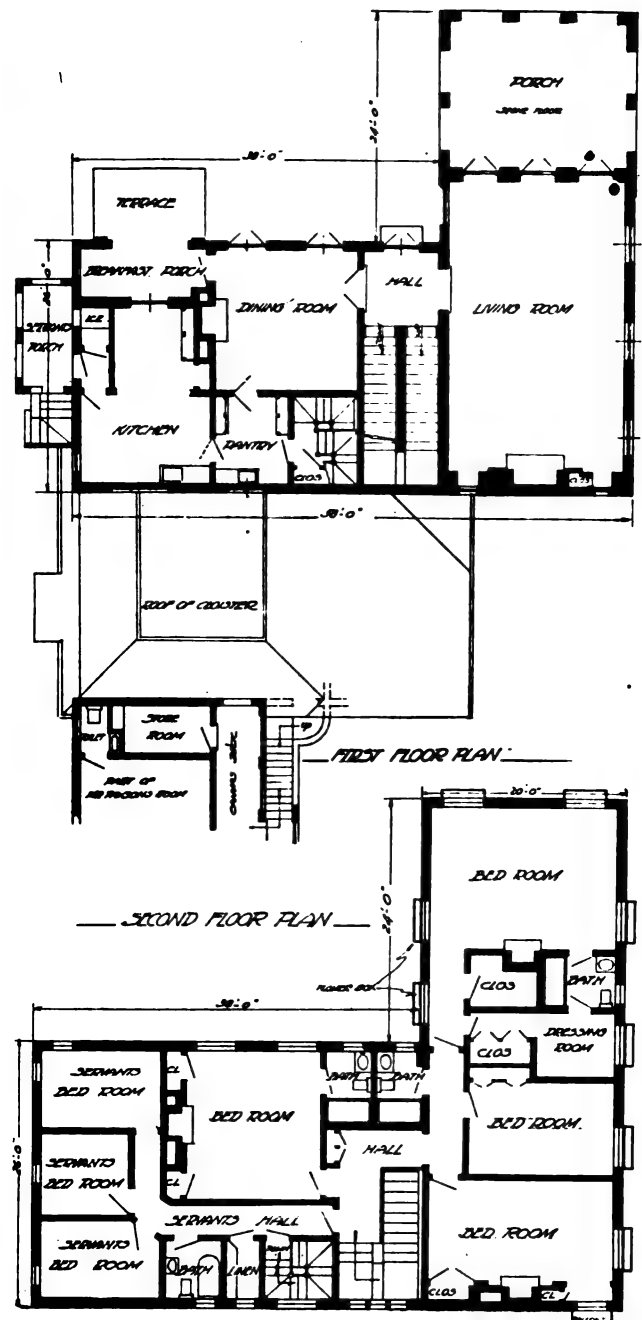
FLOOR PLANS, MR. PAYSON'S HOUSE—HOWARD GREENLEY, ARCHITECT
